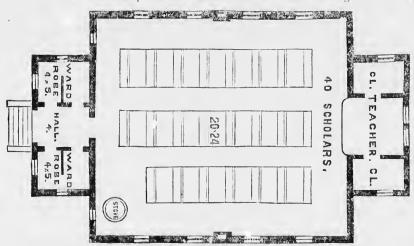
GROUND PLAN, ADAPTED TO DESIGN NO. 12, Fig. 75,
